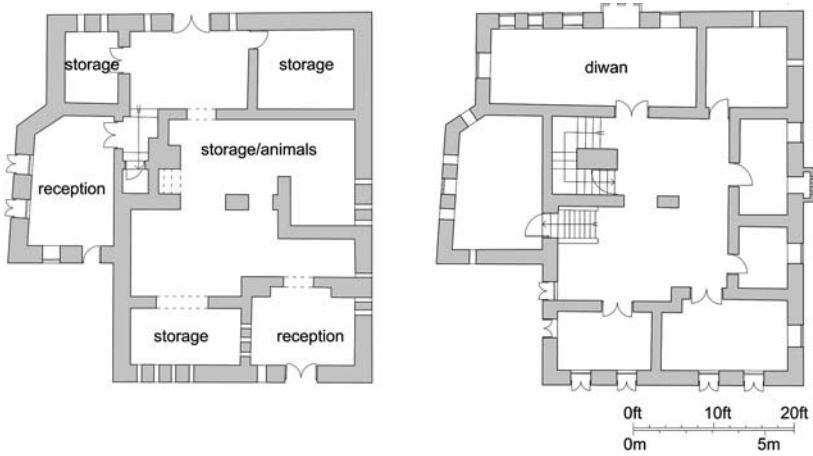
Ground-floor plan (left), First-floor plan (right), Bayt al-Mahfadi, Mocha, Yemen. Drafted by Senem Zeybekoglu.
